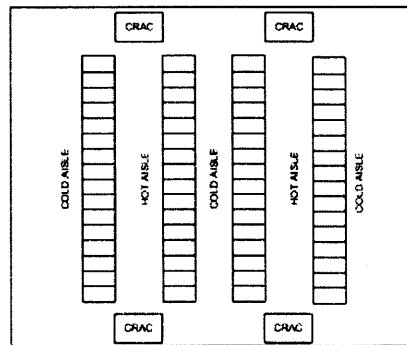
Rack arrangement showing layout of CRAC units in relation to the hot/cold aisle (top view). This diagram is for a raised floor data center.⁸⁸
